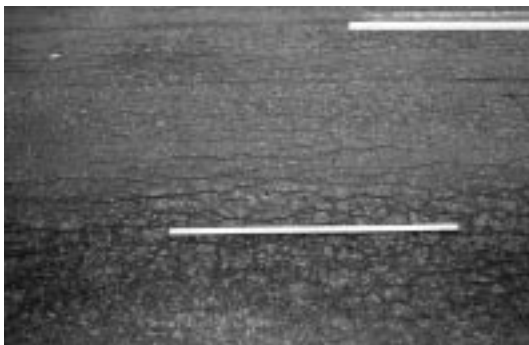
Interstate 64's continuously reinforced concrete pavement, reconstructed in 1987, near Charlottesville, Virginia, after 14 years of service. Pavement is in excellent condition, as shown in lower photo.
